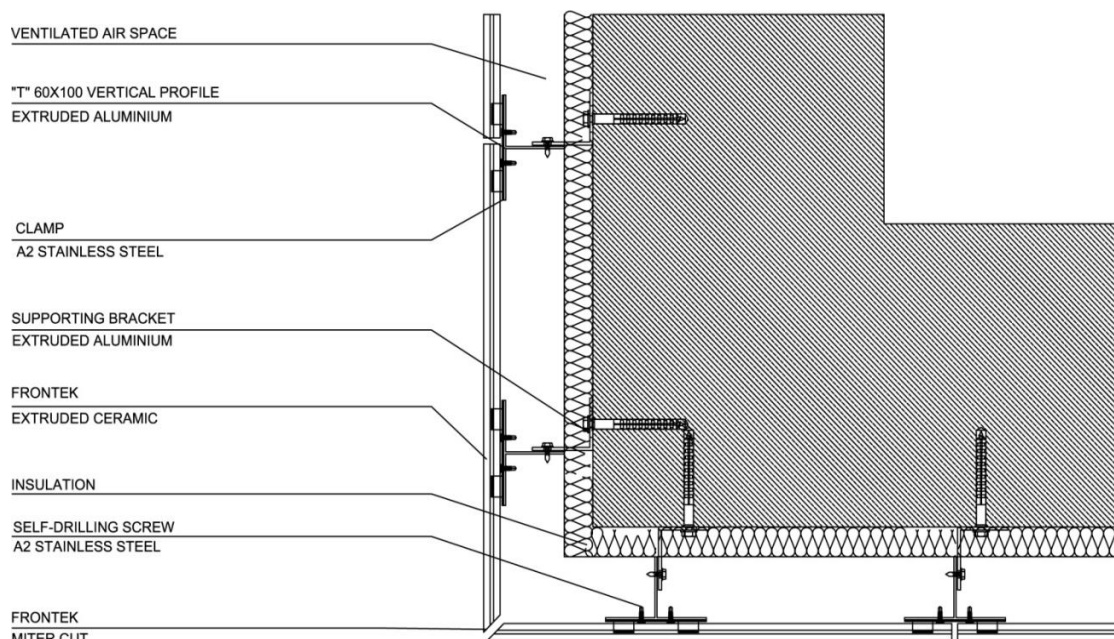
DETAILS OF EXTERNAL CORNER – FRONTEK PLUS VERTICAL
